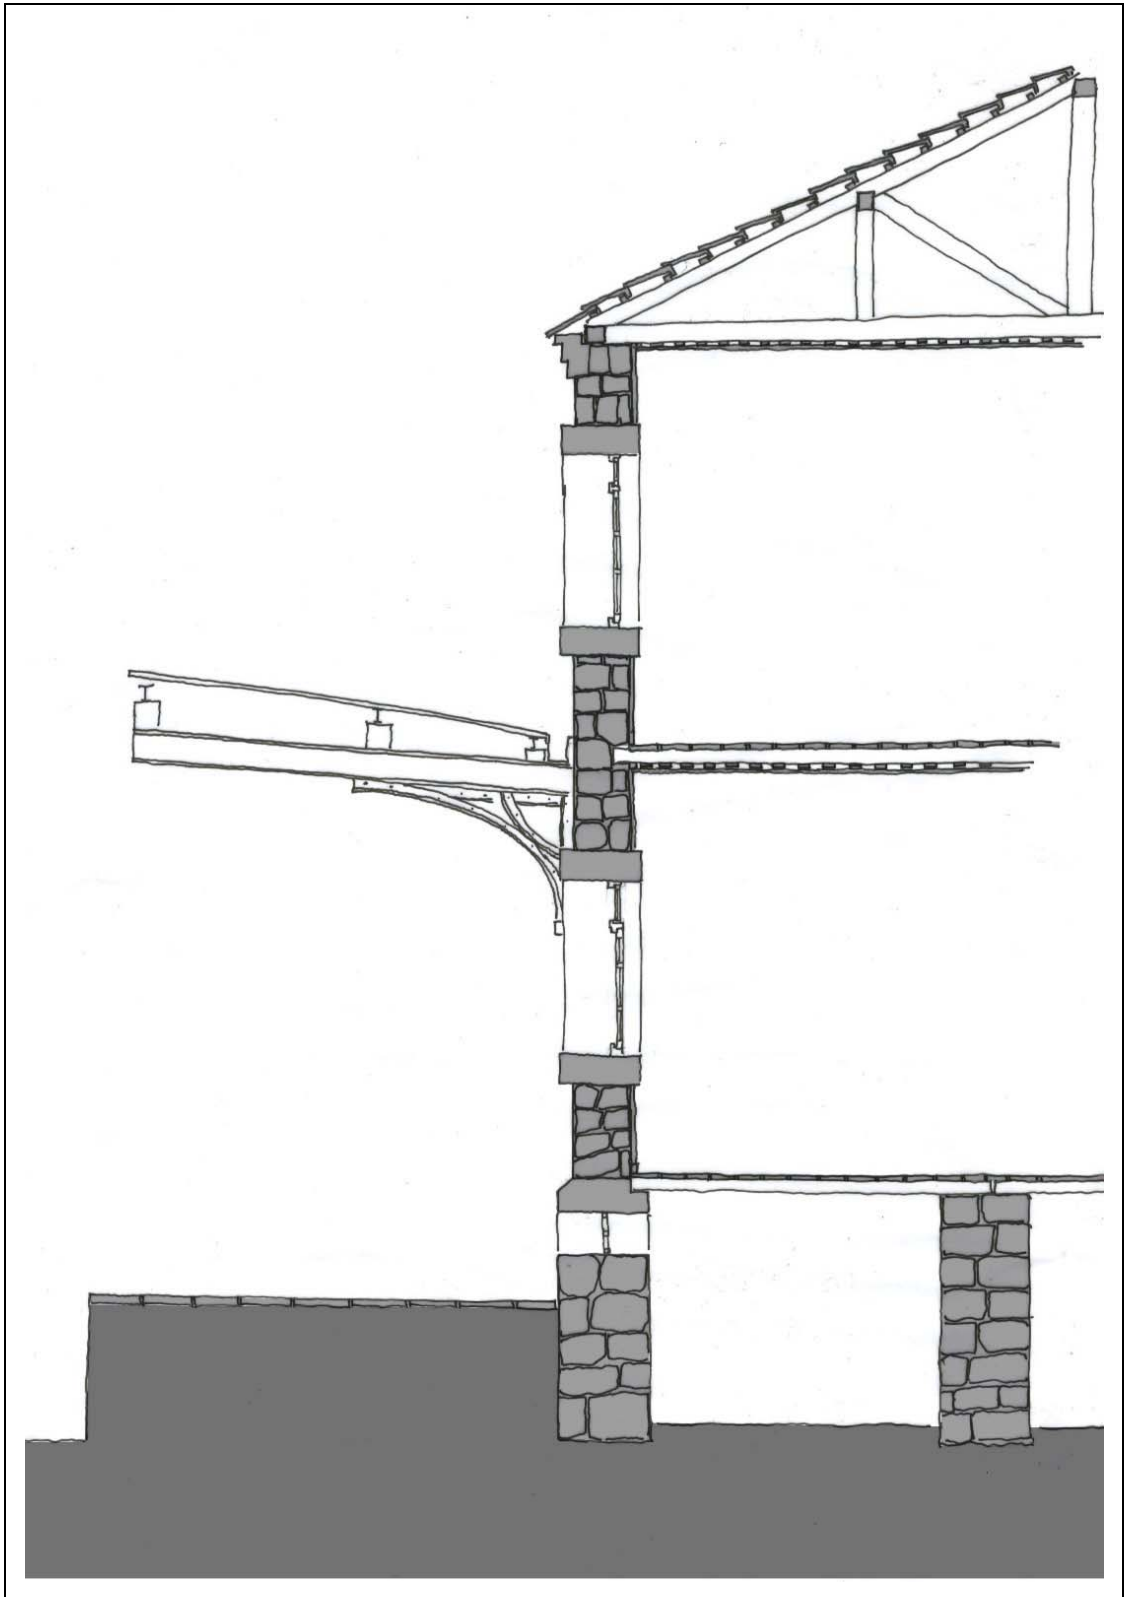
Section showing system details of stone masonry two-storeys station building
